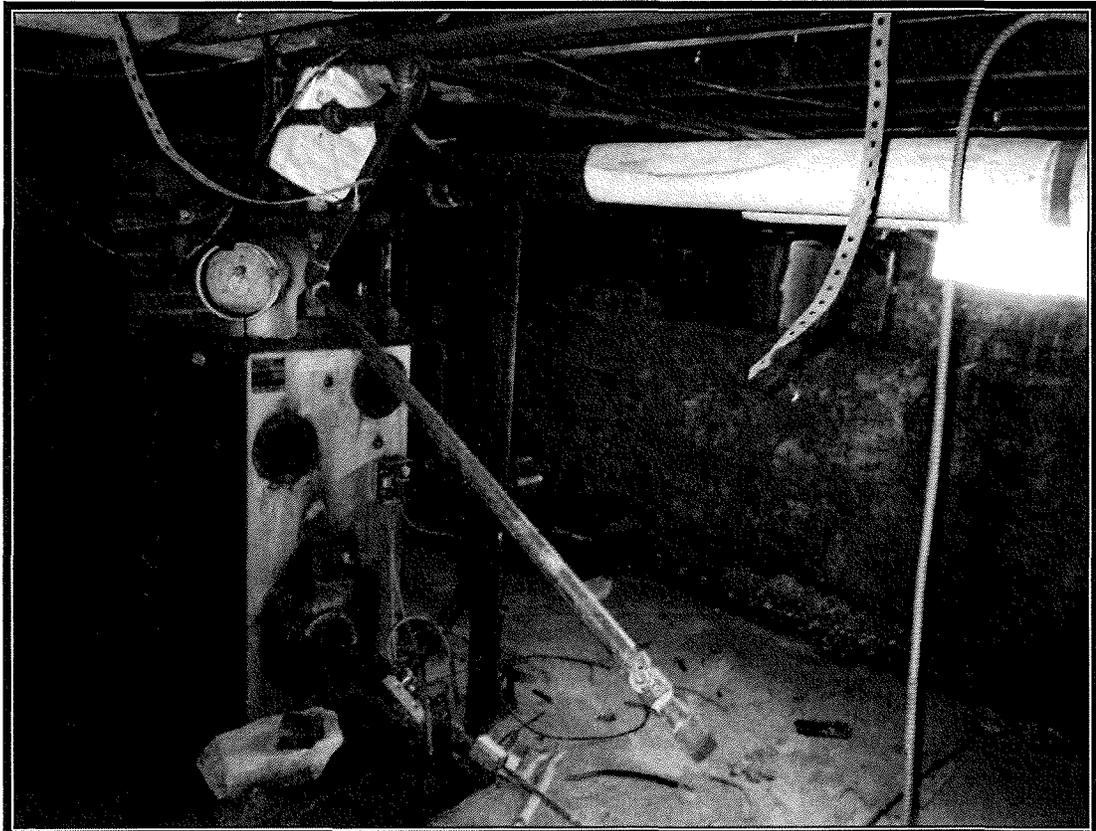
Damaged and deteriorated boiler in rea building. Loose and unsupported wiring in violation of Code.
